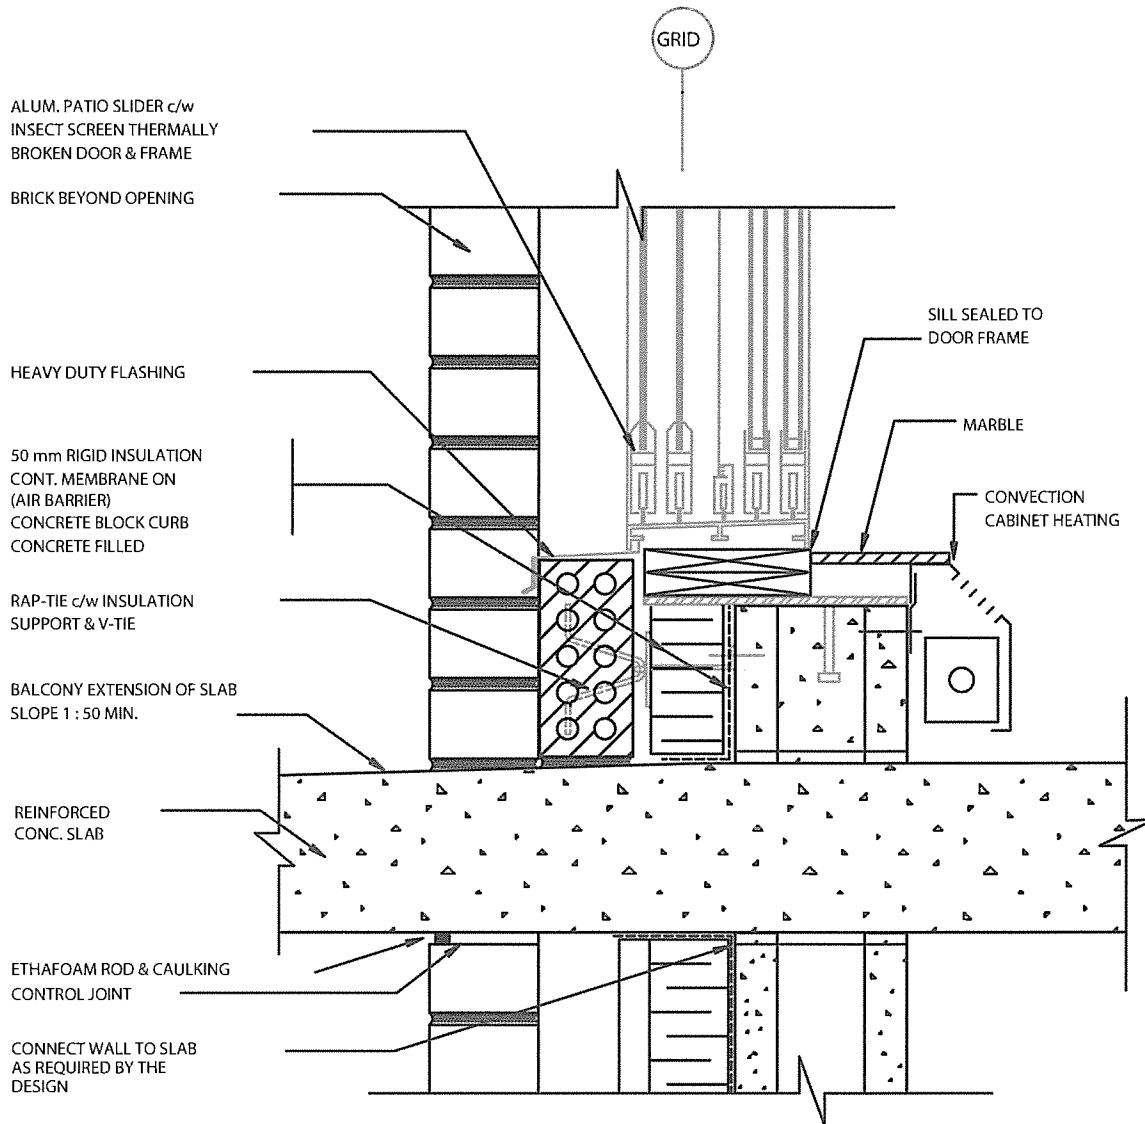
BRICK VENEER / CONCRETE BLOCK - BALCONY AT PATIO DOOR DETAIL
